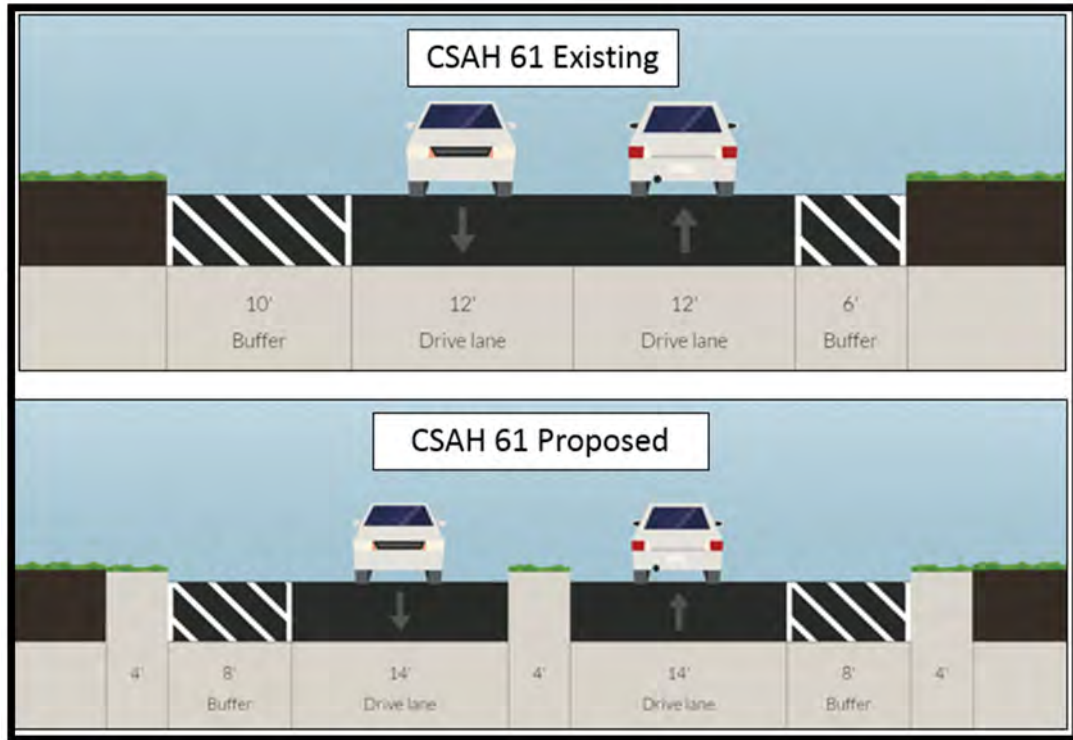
Eastern Project Subarea Typical Sections - East of Stoughton Avenue.
